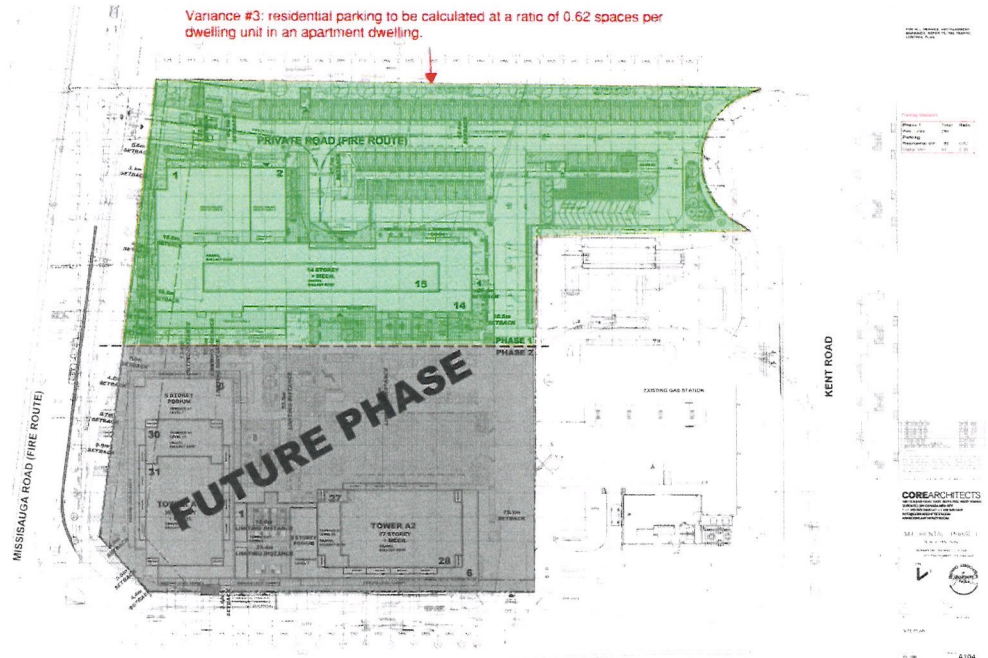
Proposed Site Plan, with Proposed Variance #3 – 0.62 Minimum Residential Parking Rate
